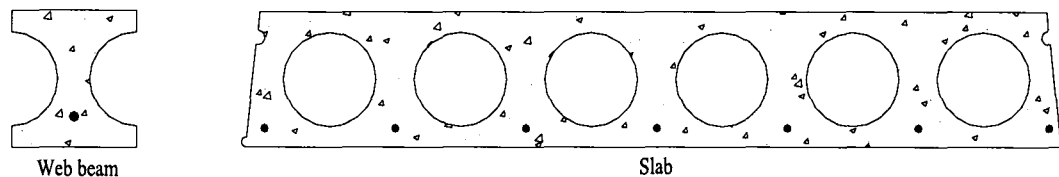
Typical cross-section of web beam and Hollow Core Slab.
